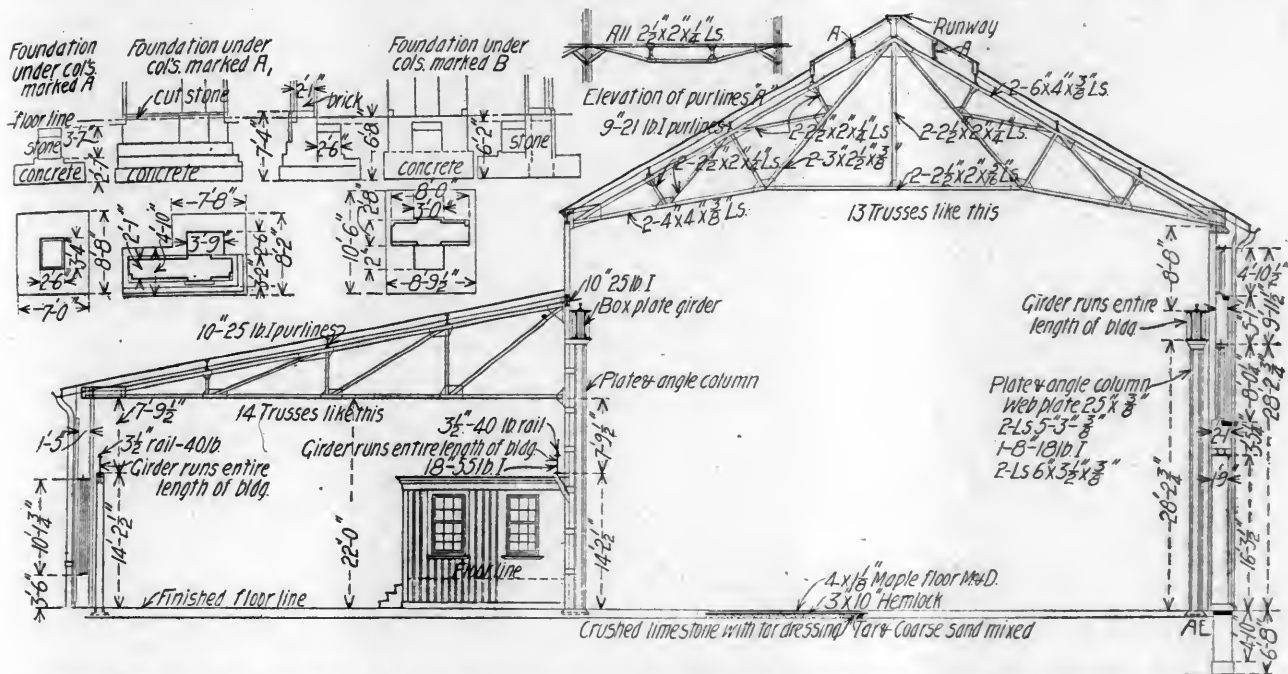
Boiler Shop—Section of Roof and Crane Columns Showing Foundations which are Located in Fig. 4.
